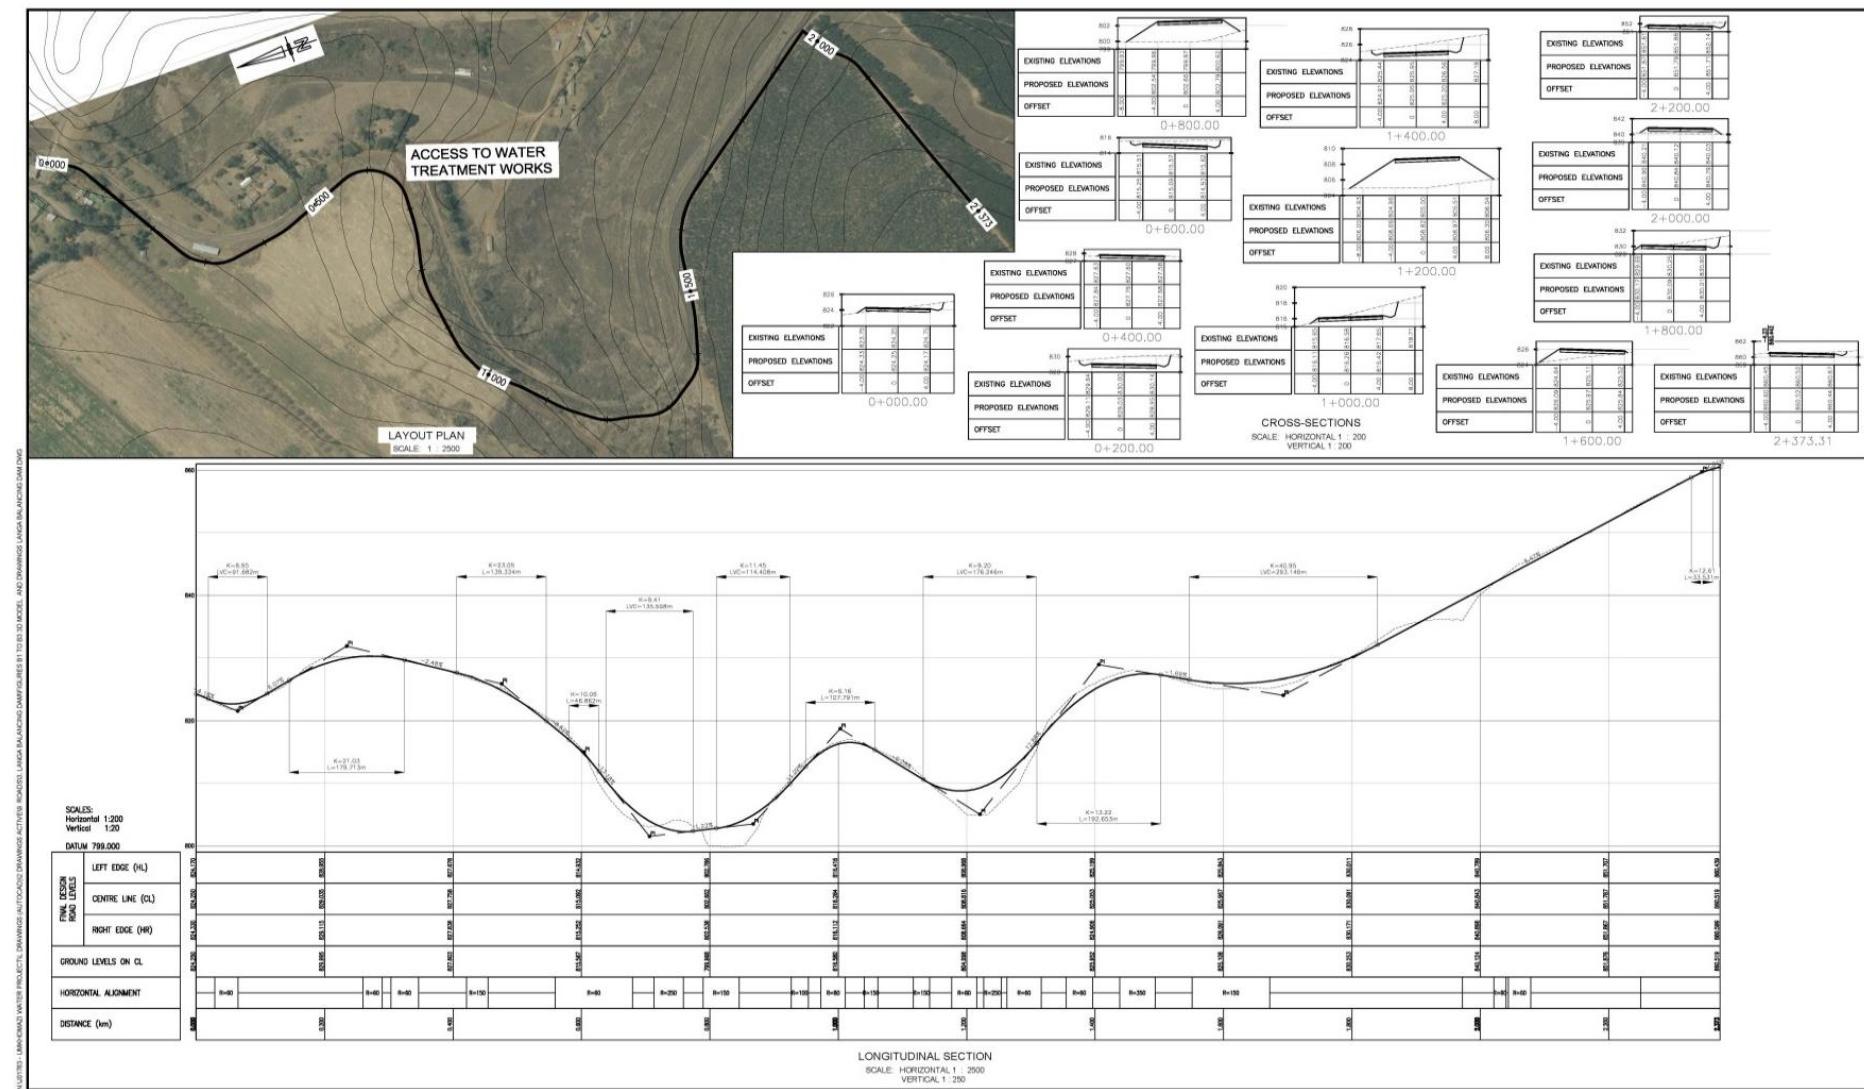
C.16: Langa Dam – Layout plan, longitudinal section and cross sections of access road to water treatment works
